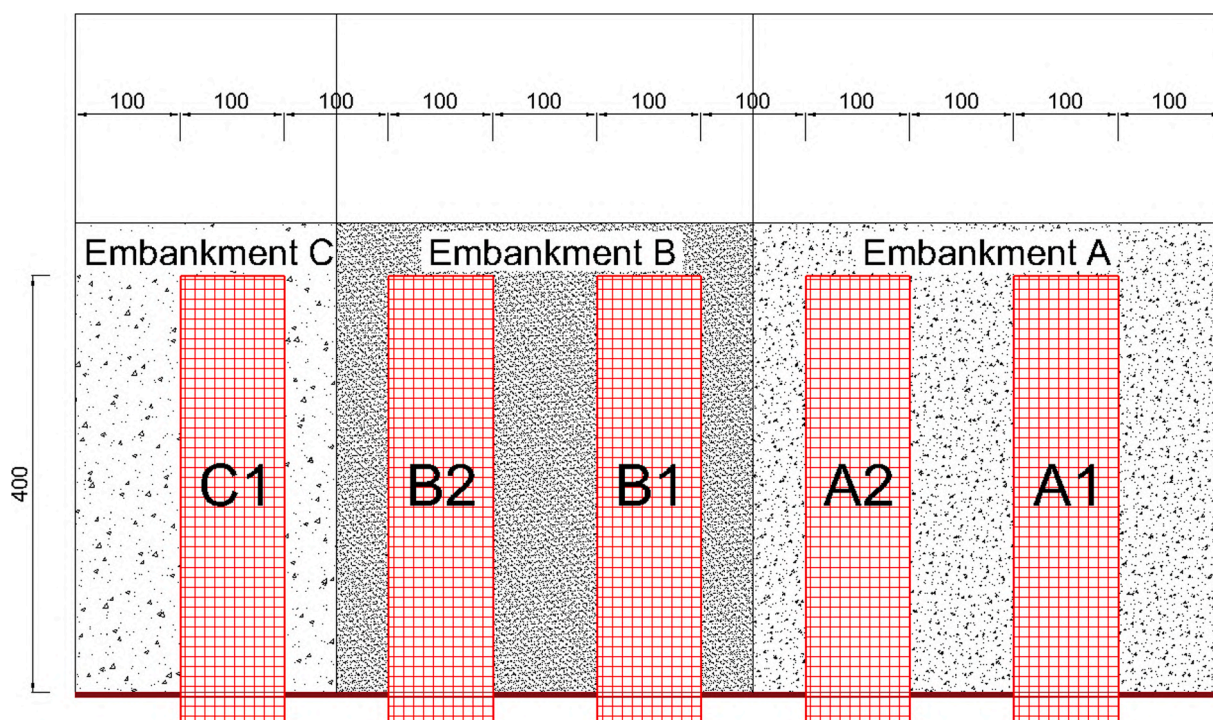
Schematic plan view of the test embankments with geogrid layout. Measures in cm.
